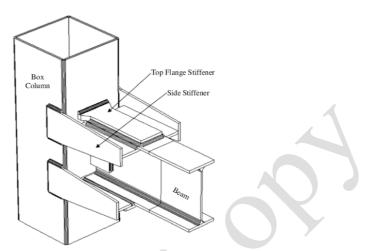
Typical I-beam to box-column connection [Kiamanesh et al., 2010]
